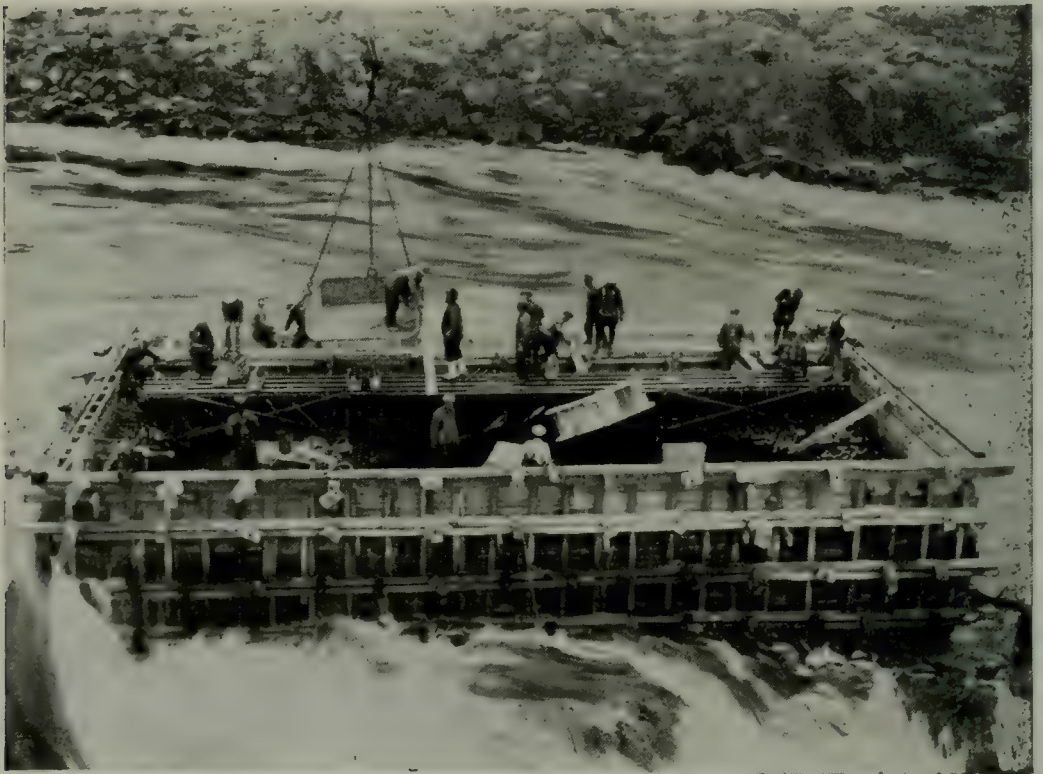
CONSTRUCTING OBELISK FOUNDATION
